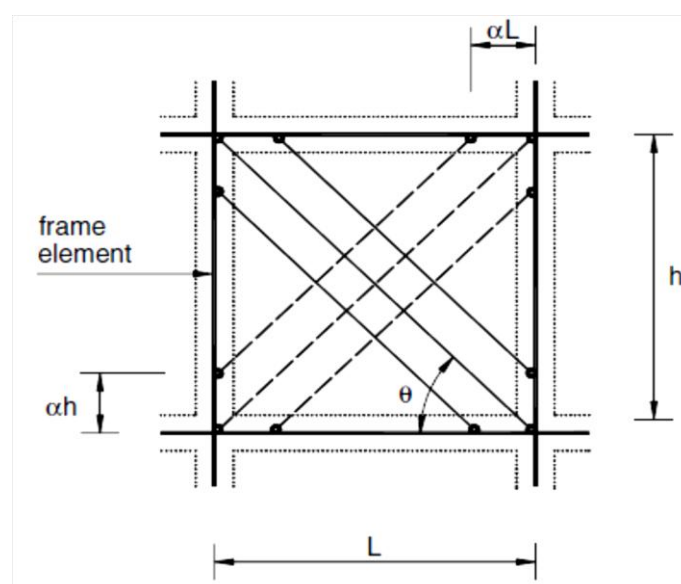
, Six-strut model for masonry-infill panel in frame structures, Asteris, P.G et al(2011)
